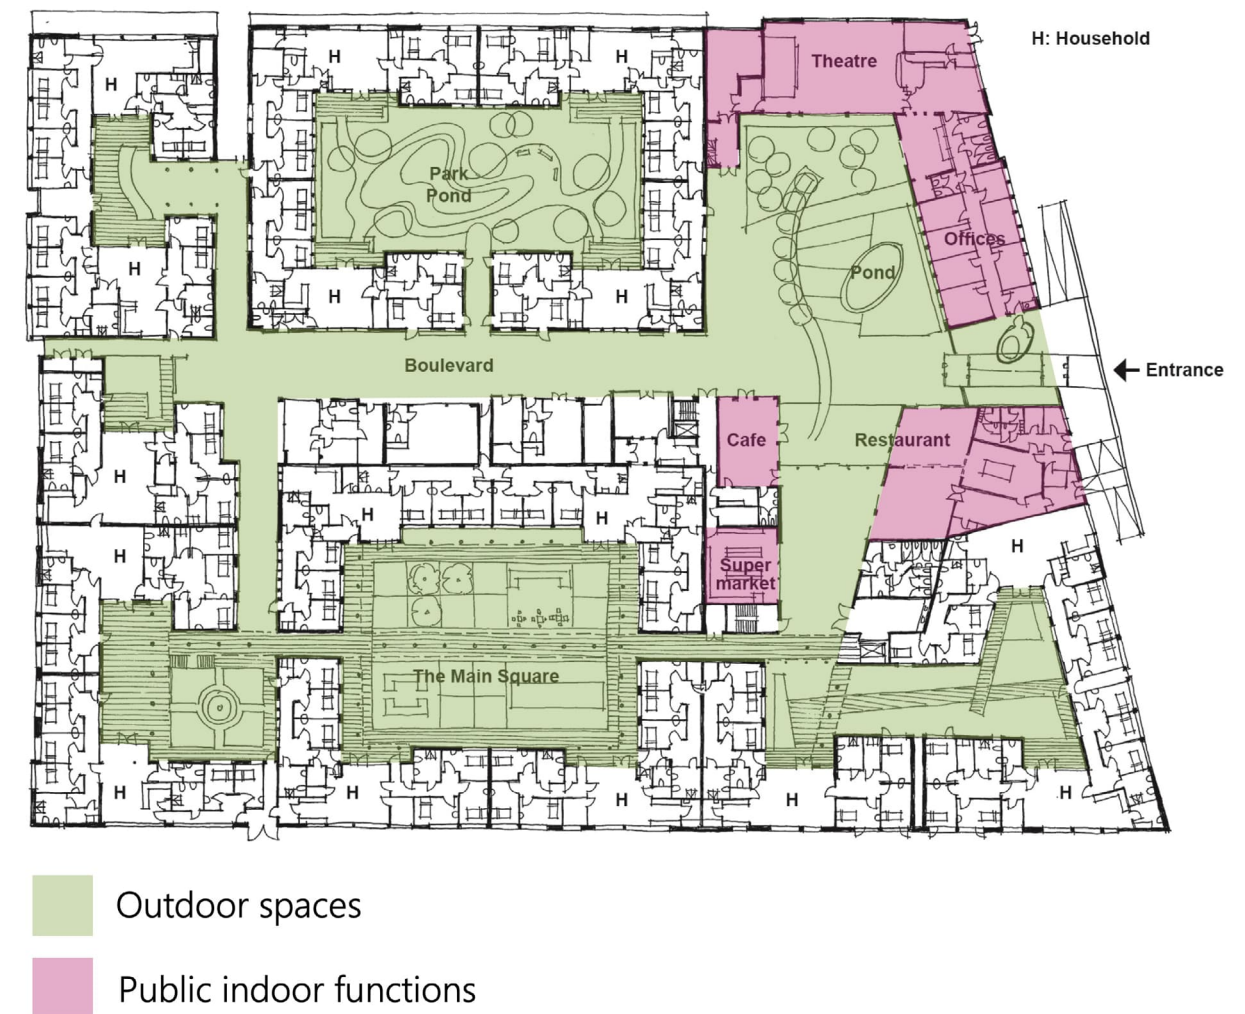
The 1st Floor Plan of De Hogeweyk
